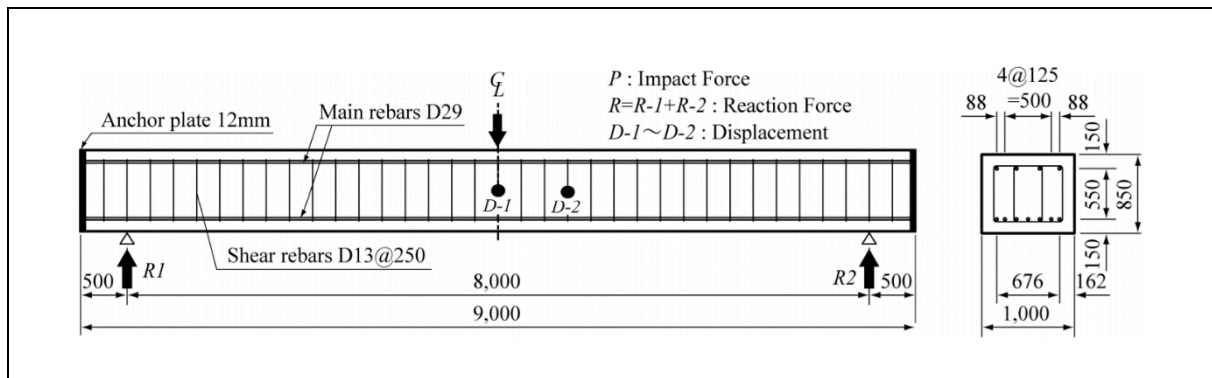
Reinforcement Layout of the Reinforced Concrete Girder in the Impact Test Carried Out by Kishi & Bhatti (2010)
